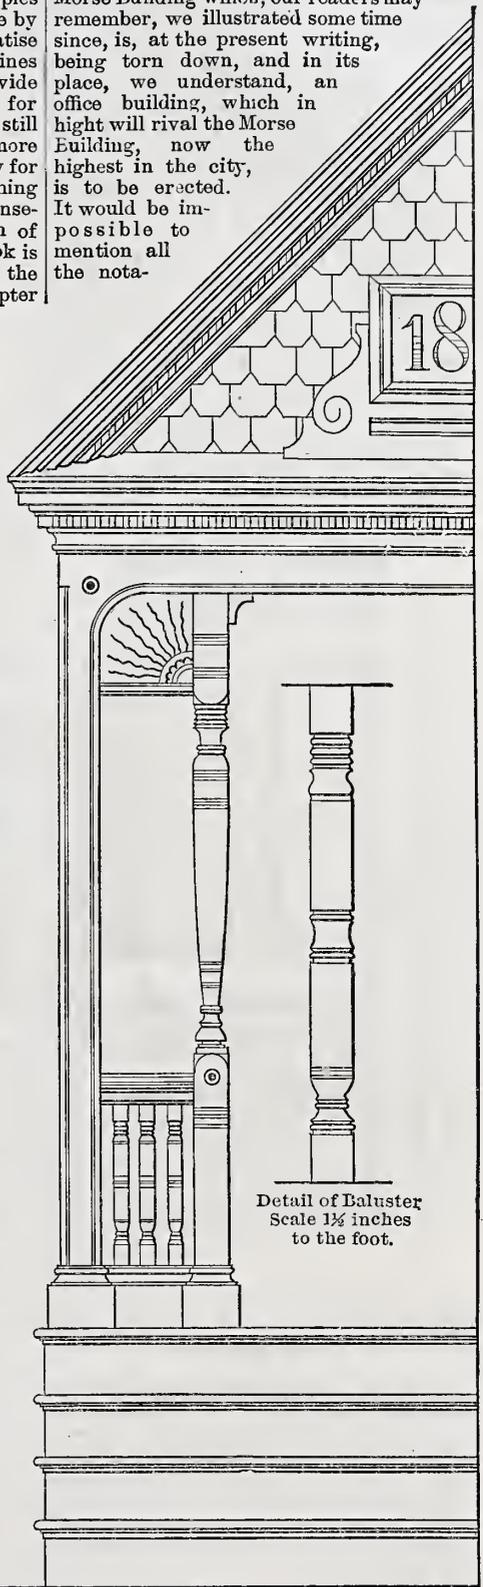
Half Elevation of Front Porch.—Scale, 1/2 Inch to the Foot.
